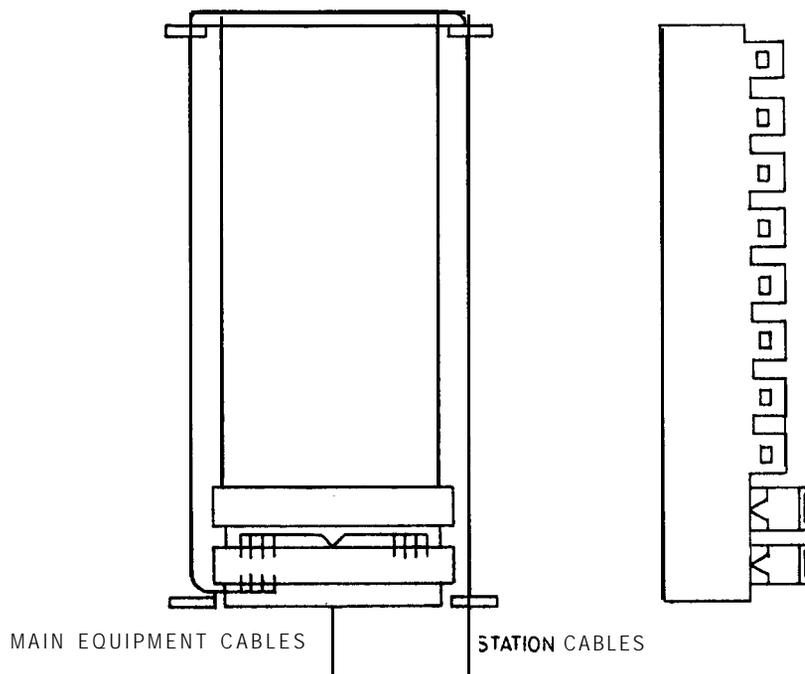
BACKMOUNT CHANNEL CABLE LAYOUT
